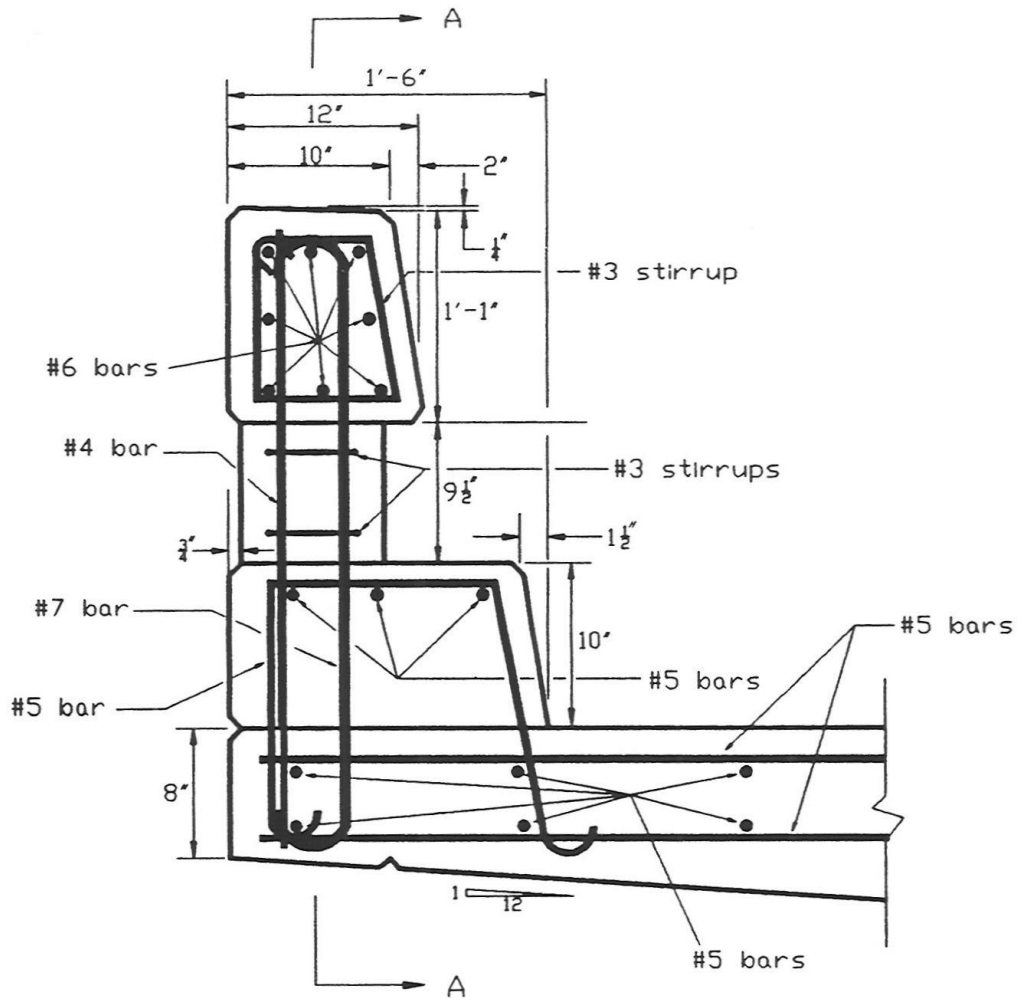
Natchez Trace Bridge Rail Design Details, Test No. NTBR-1 [2]
